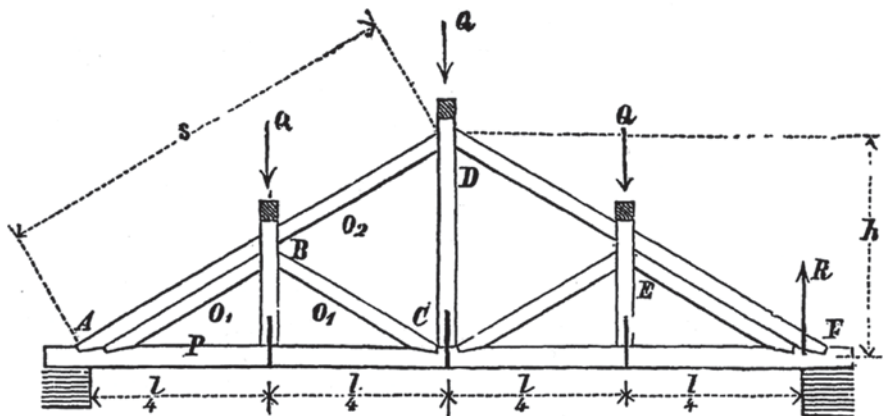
German truss loaded only at joints. (Breymann 1887)
